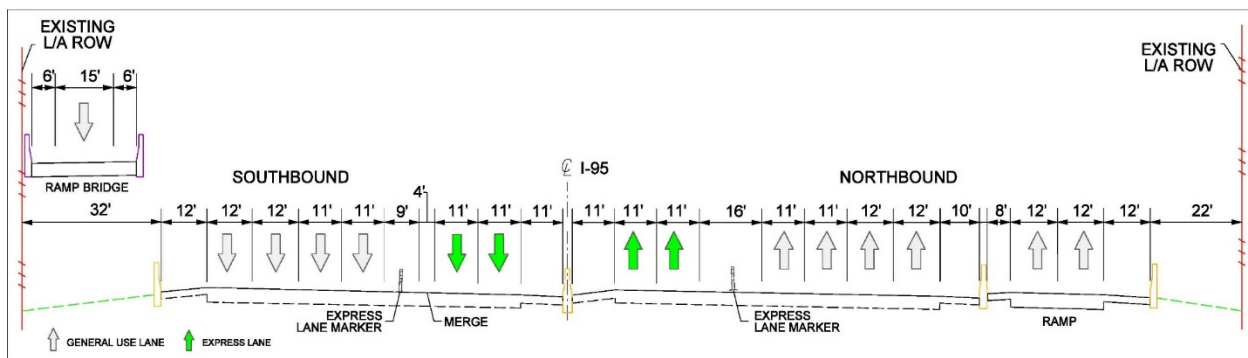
Alternative 2 Roadway Section North of Pembroke
